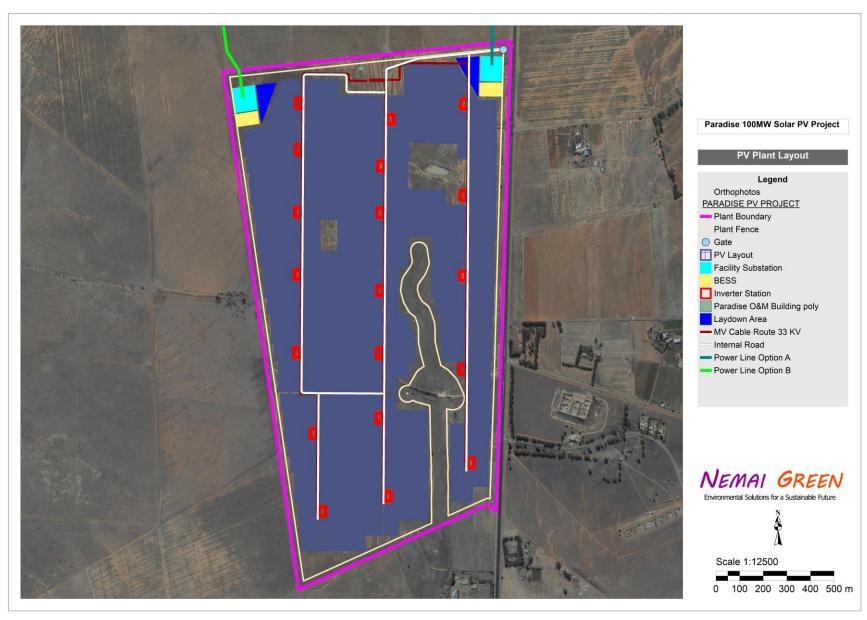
Proposed Layout of the Solar PV Plant - PV Layout Option A
